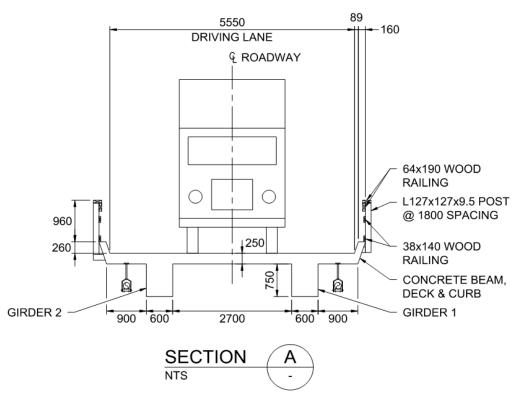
Lions Bay Avenue Bridge Over Harvey Creek - Section
